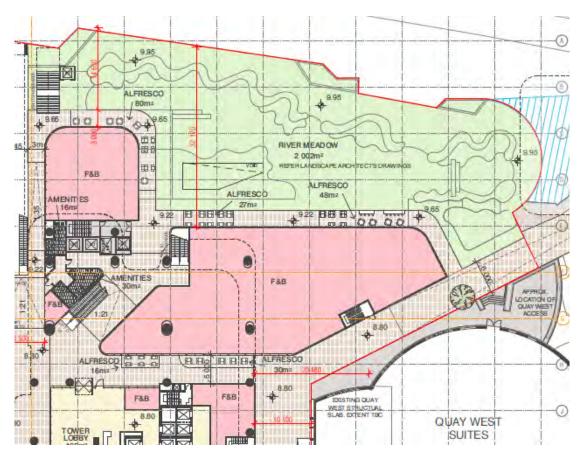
2,000m² Publically Accessible Open Space (Source: application material)
